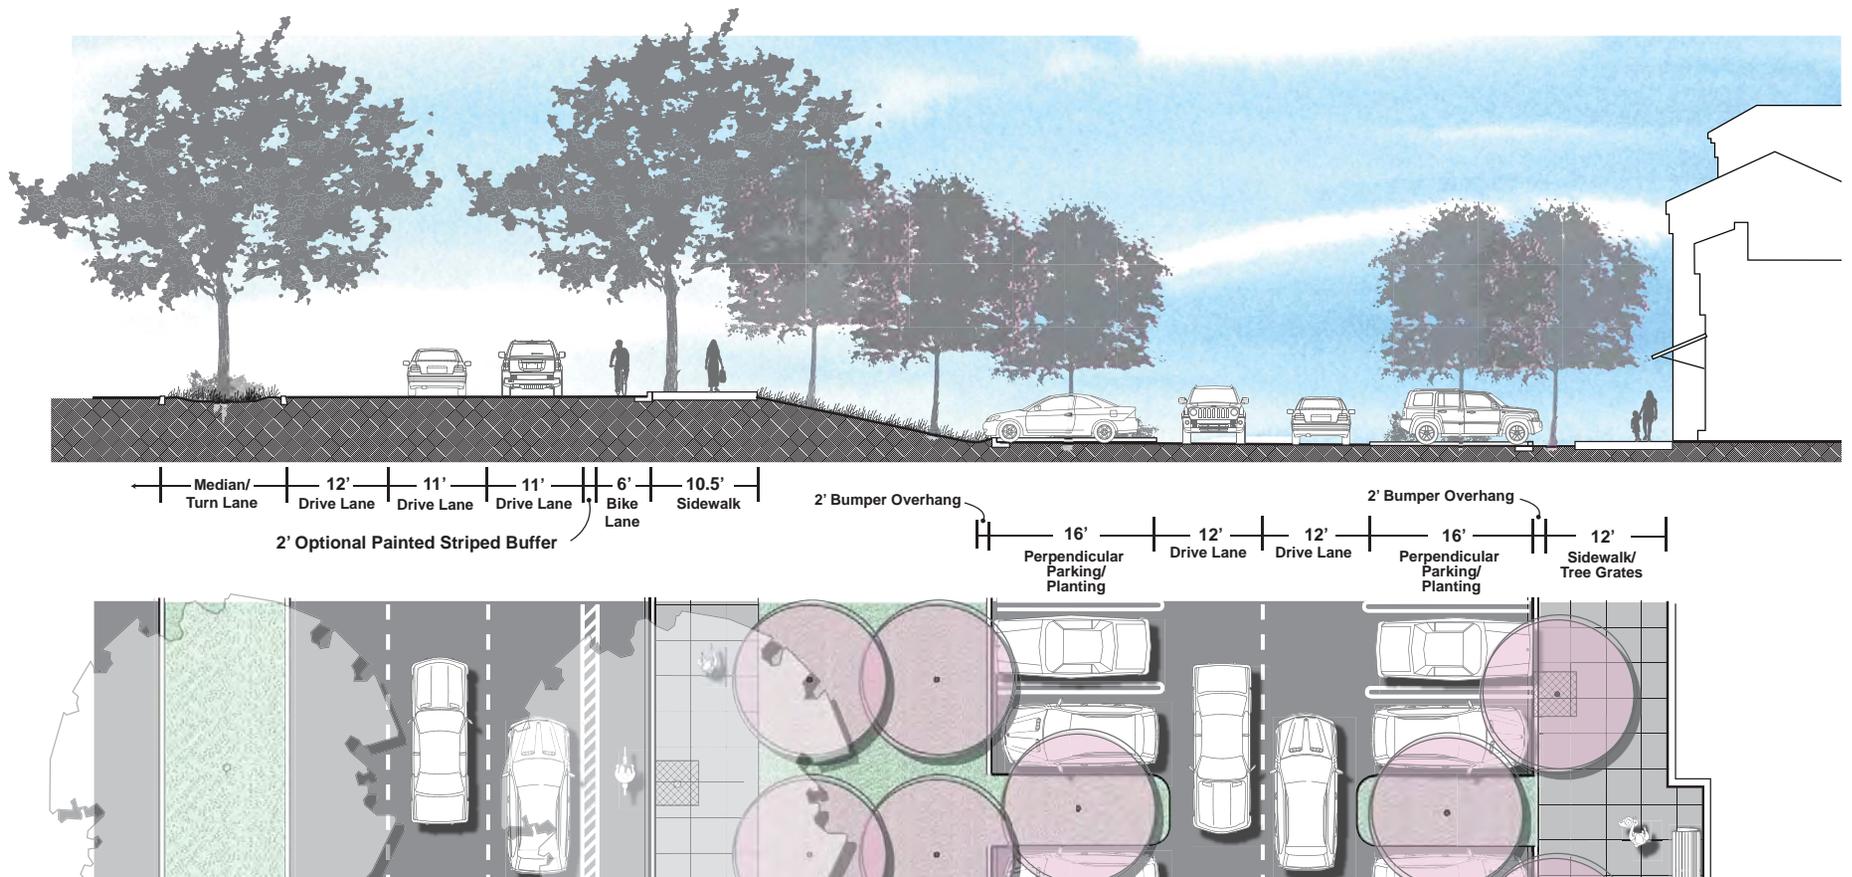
Section 5: Los Gatos Boulevard north of Neighborhood Street. Note: Sidewalks which extend outside of right-of-way will require an easement.
